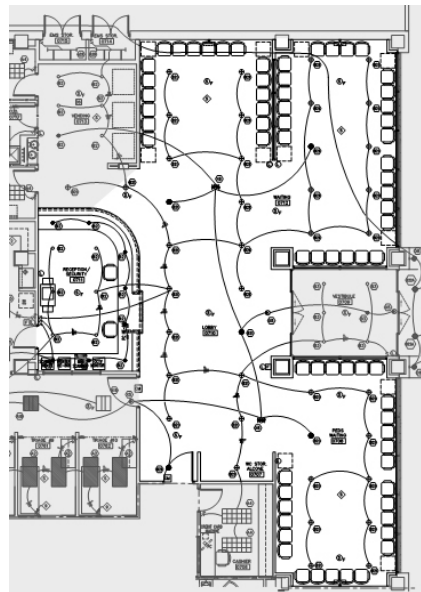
Emergency department lobby and waiting area floor plan, not to scale (dwg. E04.0A)
